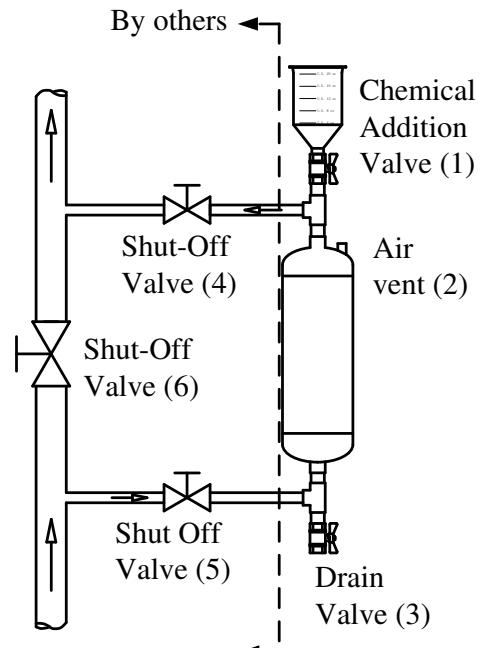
Installation method 2 – CBF installed in parallel with the system piping
